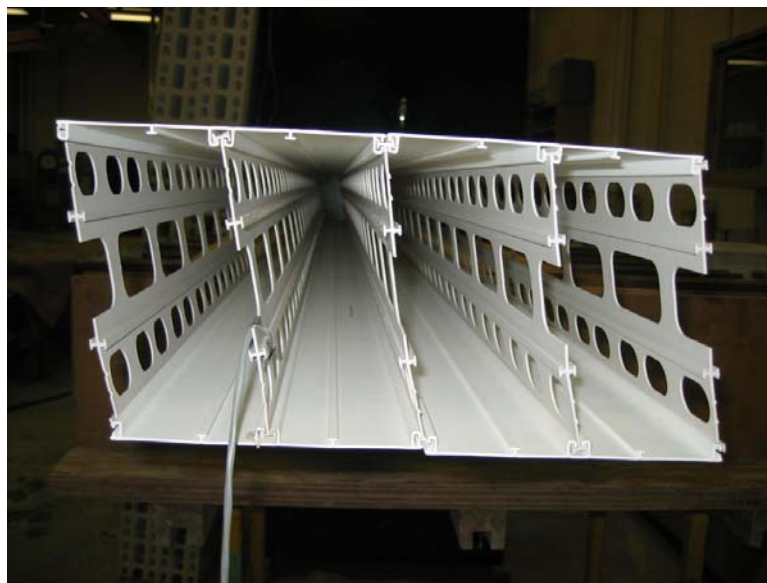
Cross section of a wall specimen with middle connectors (Specimen D8M)
